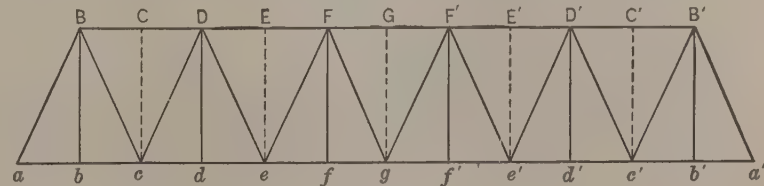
(d). Subdivided Warren Truss or Warren Truss with Verticals. (See photograph, page 98.)
